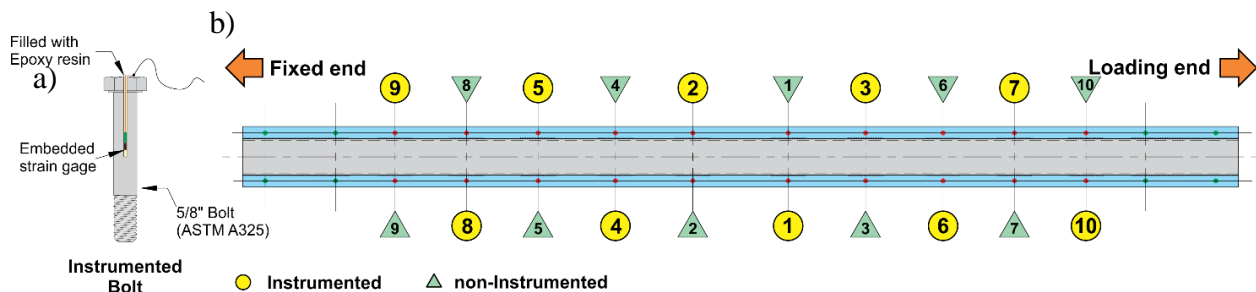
Schematic view of an instrumented bolt; b) arrangement of the instrumented bolt in Specimen 9.
